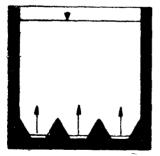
Diffused Air Activated-Sludge Systems — Ridge and Furrows
